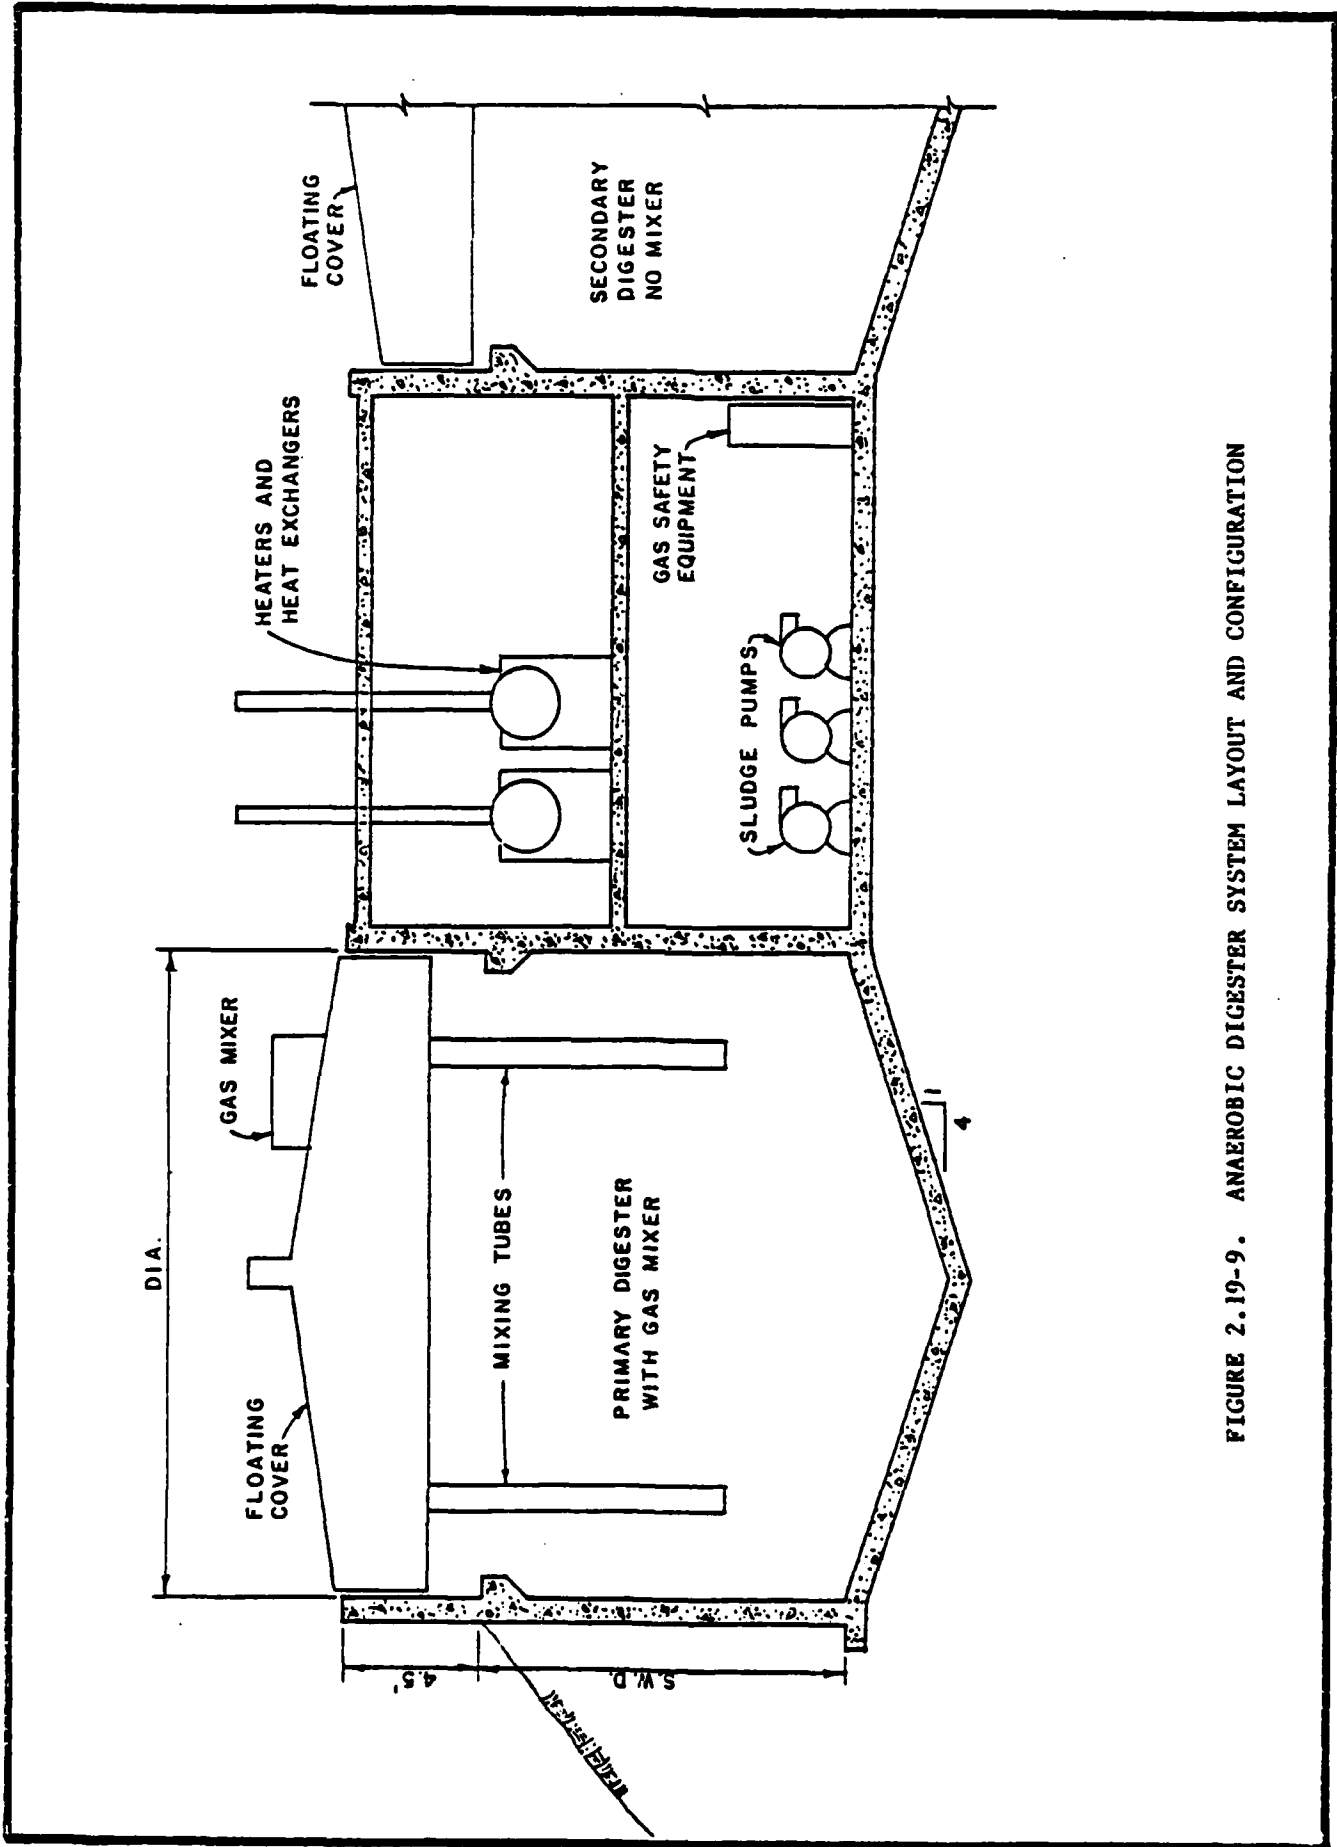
ANAEROBIC DIGESTER SYSTEM LAYOUT AND CONFIGURATION
